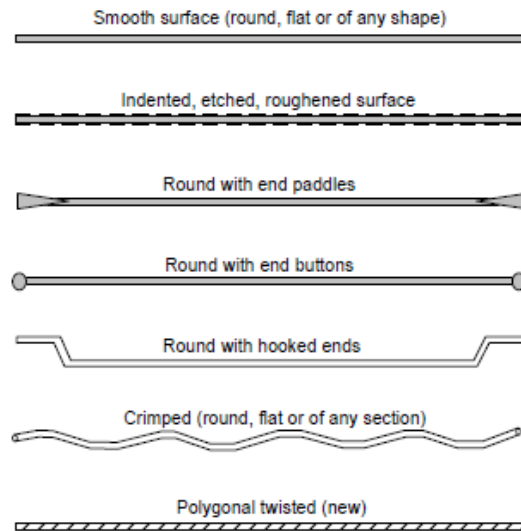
Typical profiles of commonly used steel fibres in concrete [9]
